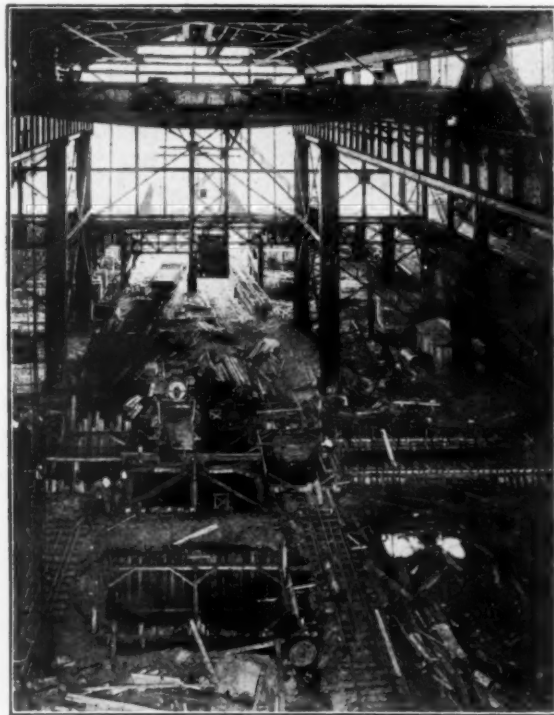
PRESS ROOM, FORGE AND FURNACE BUILDING, LOOKING EAST FROM CRANE GIRDER, JULY 16, 1920
